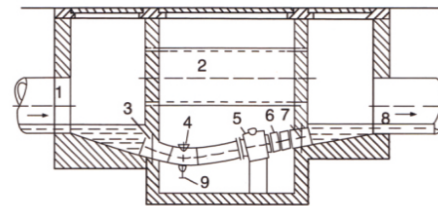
Sensor Installation in Underground Sewage Pipeline
